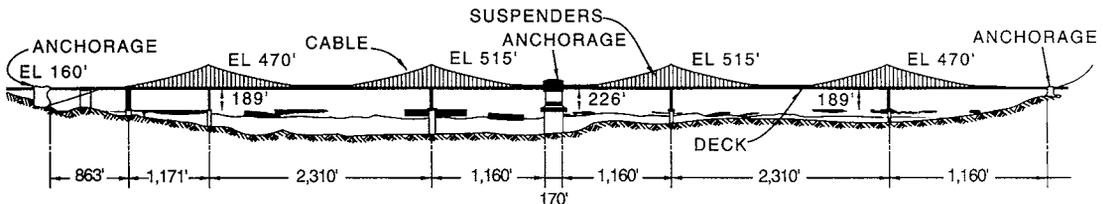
San Francisco–Oakland Bay Bridge.
